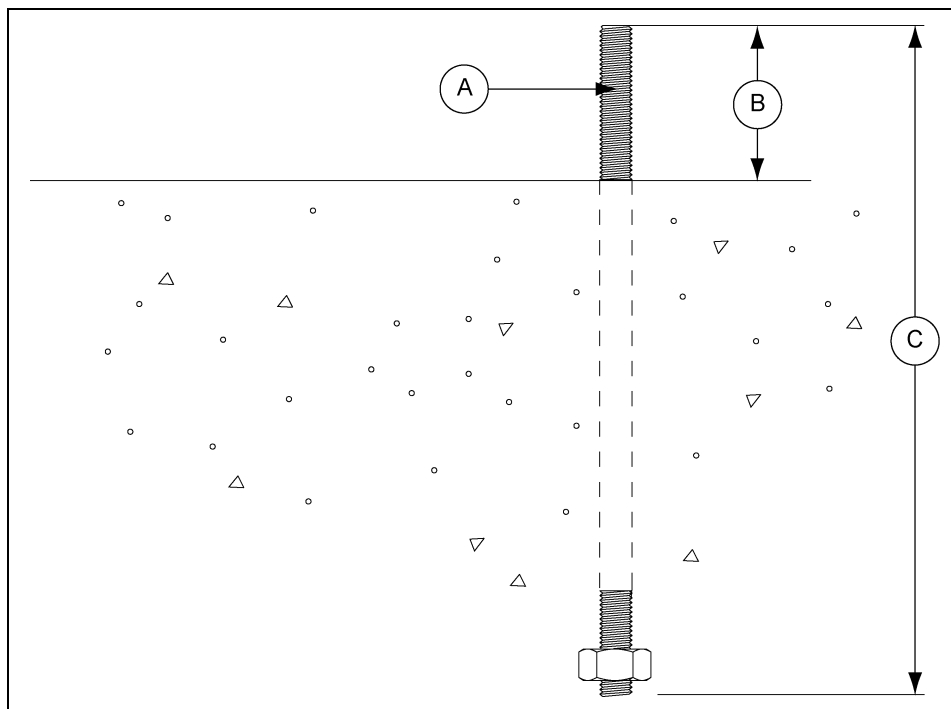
A Anchor Bolt Example (3/4" Diameter Anchor Bolt Shown)
